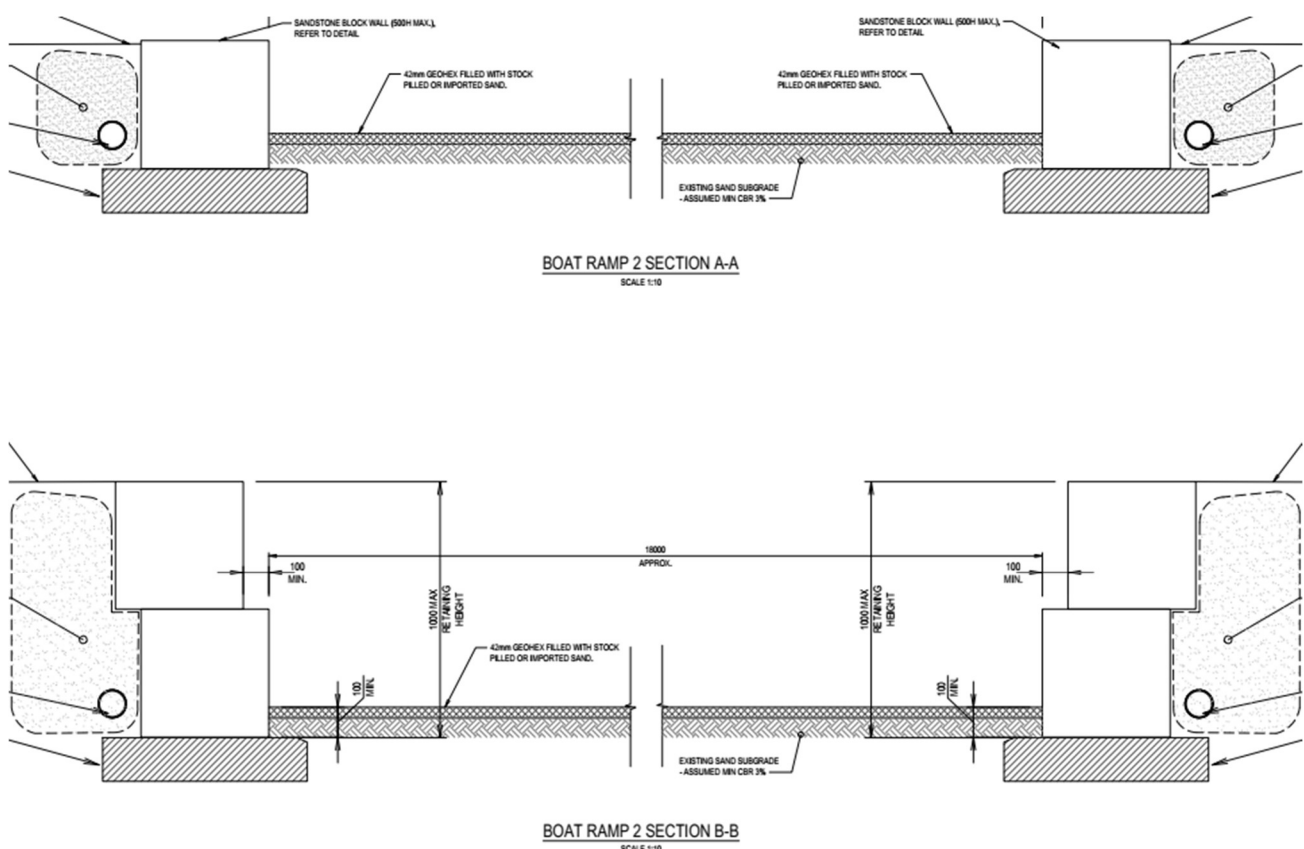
Boat Ramp 2 Section & Details extract showing the proposed layout of the works
